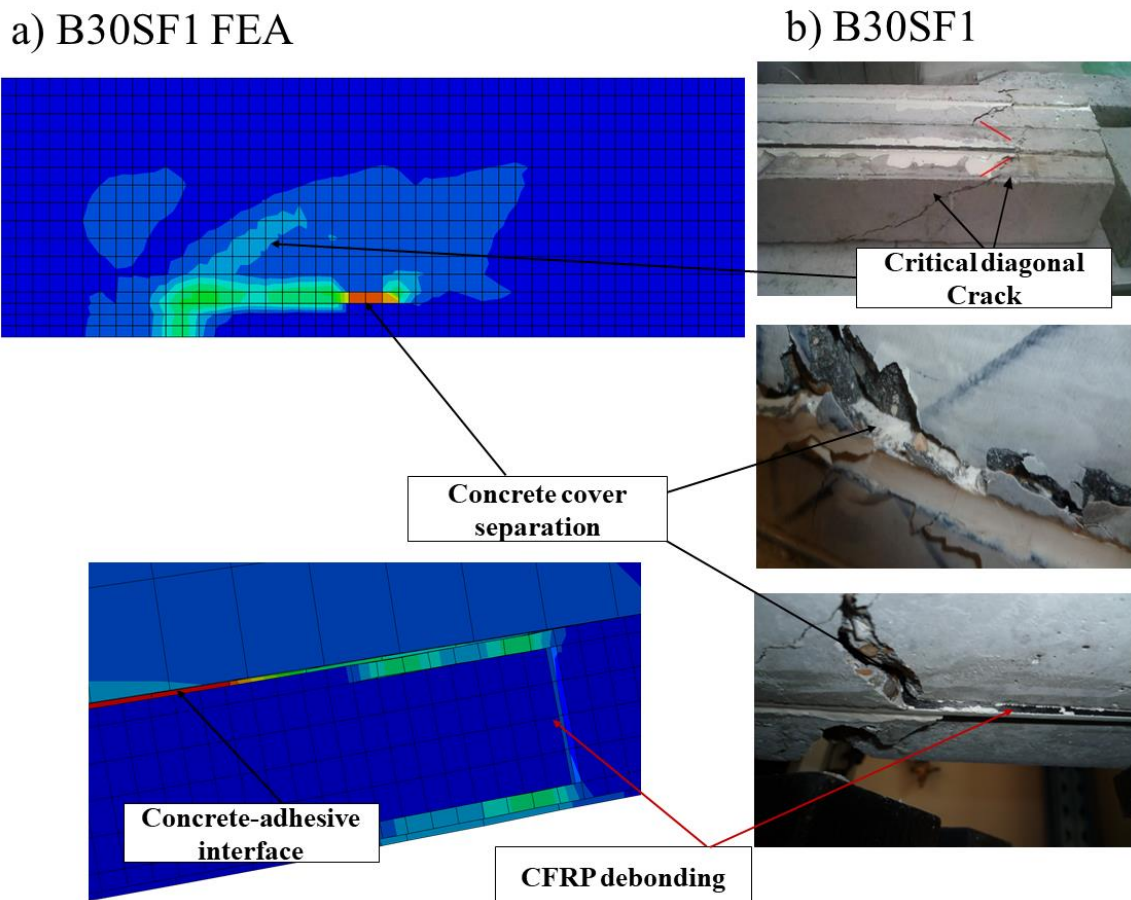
Crack patterns and Failure modes of the NSM reinforced beams
